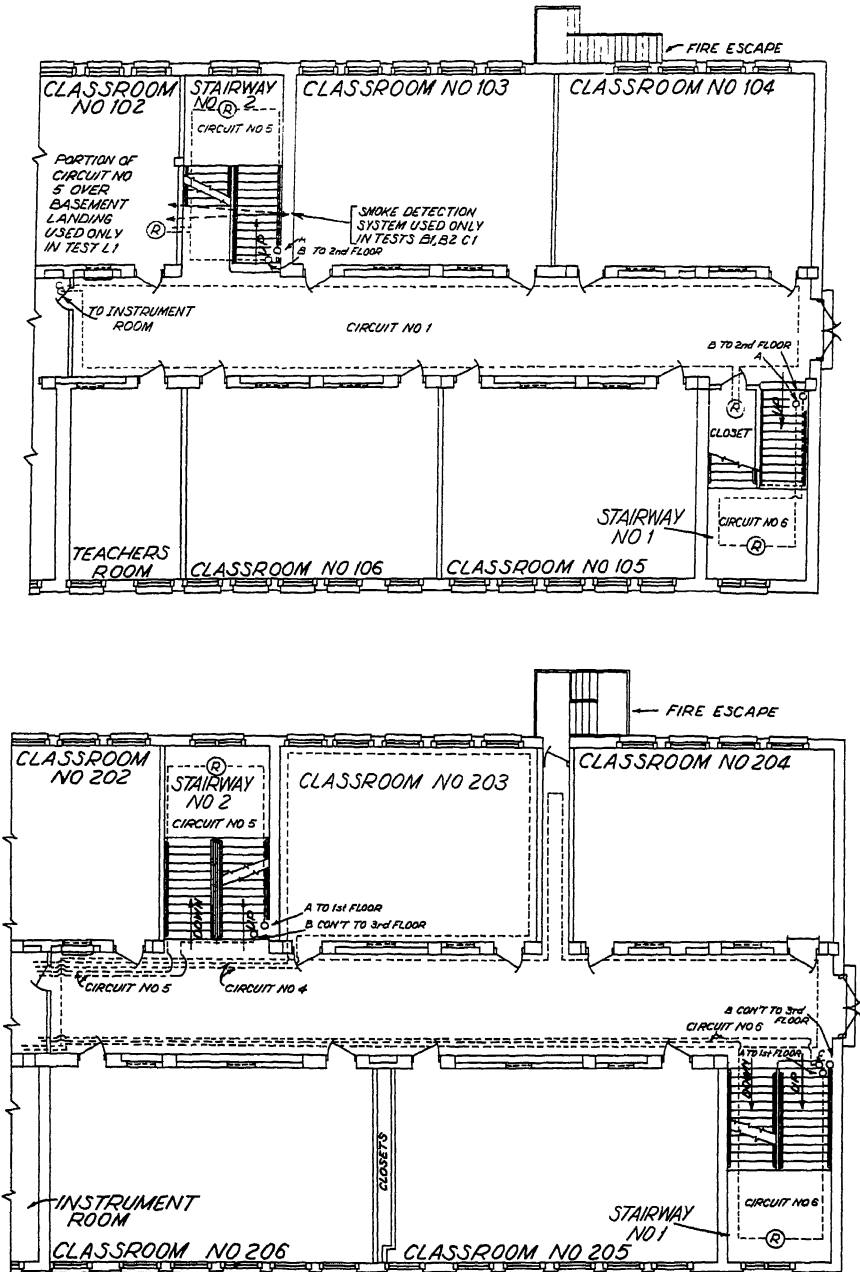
Floor plans of first (upper drawing) and second floors showing location of pneumatic tubing of rate-of-rise automatic fire detection system.
